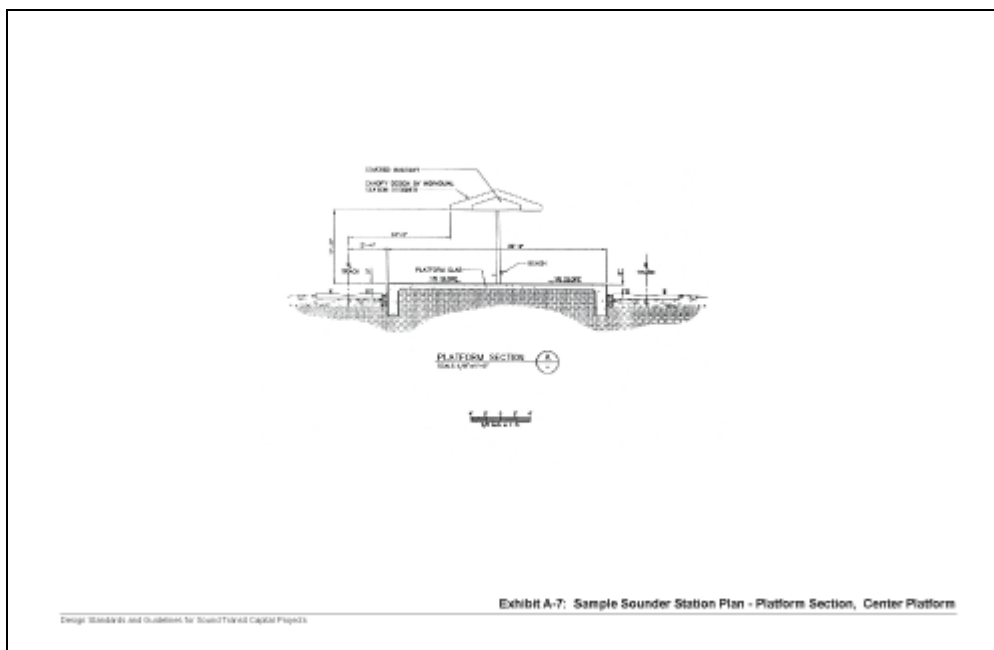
Sample Sounder Station Plan – Platform Section, Center Platform
